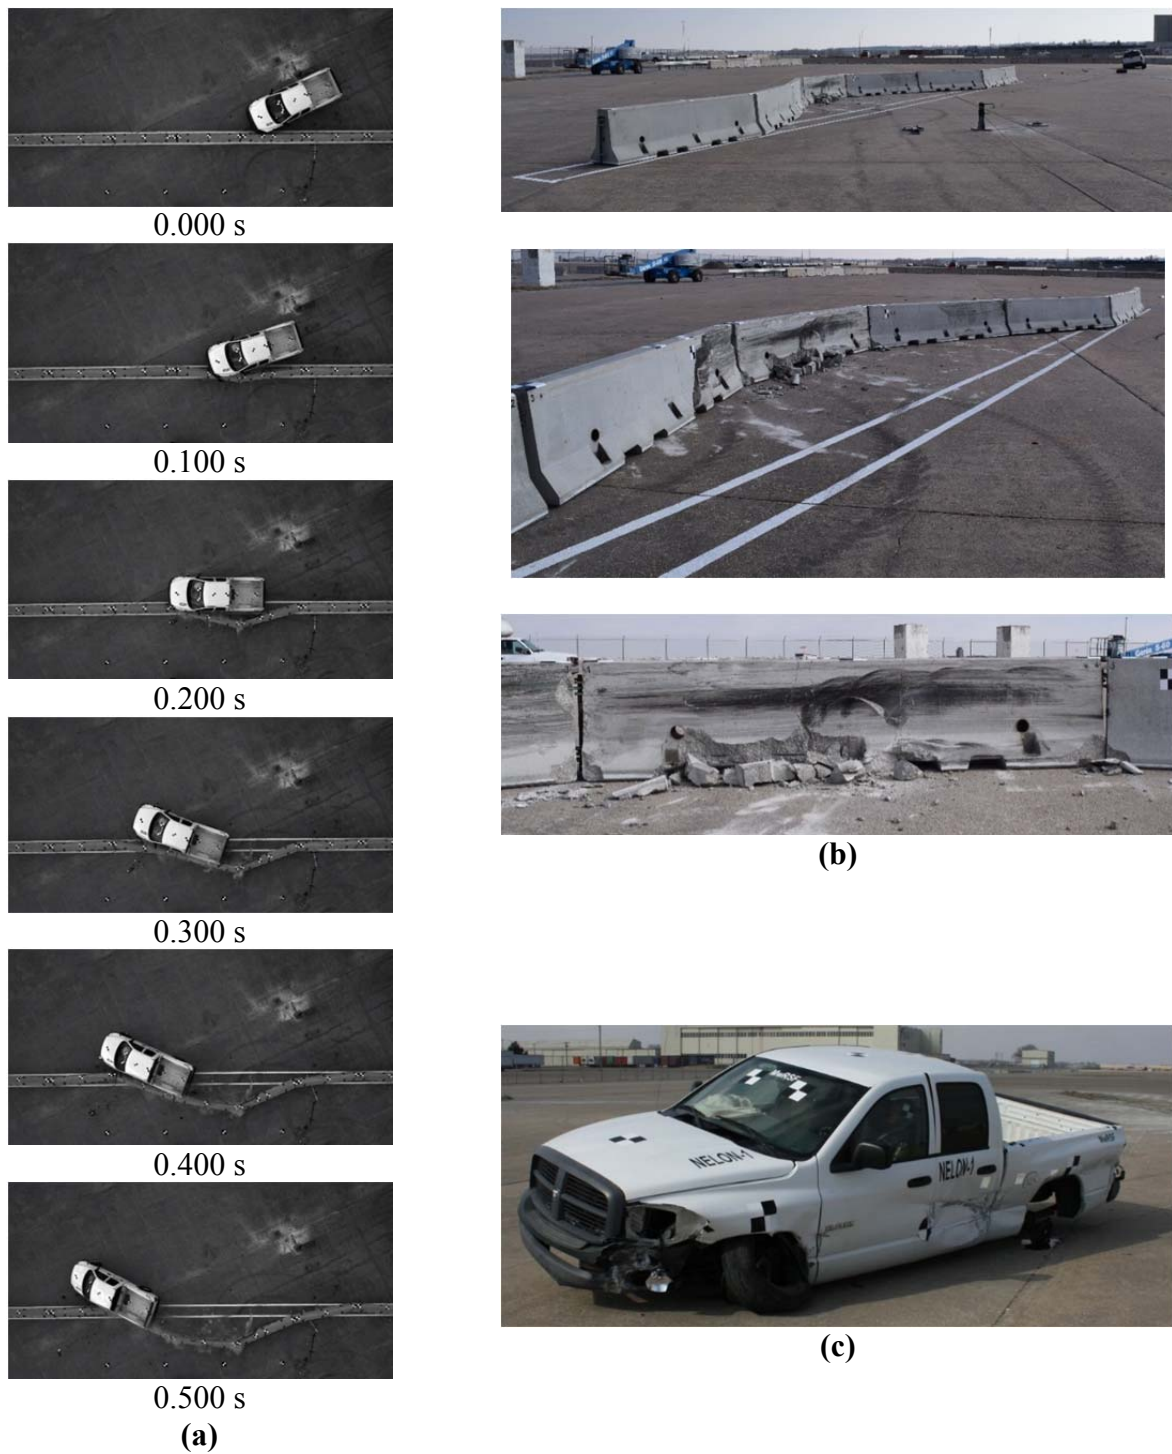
Sequential photographs and barrier and vehicle damage, Test No. NELON-1:
